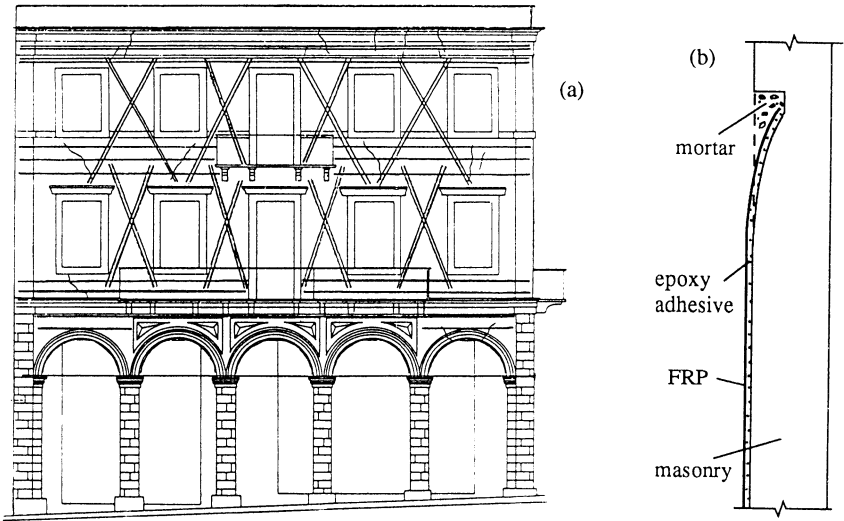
(a) The concept of surface reinforcement of old masonry building facades with epoxy-bonded FRP laminates. (b) Elevation illustrating the FRP anchorage.
